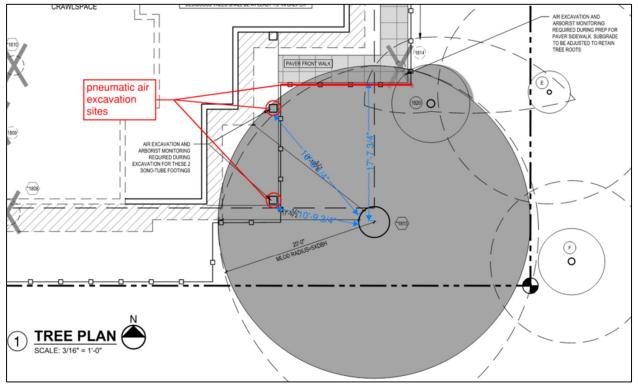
An excerpt from the tree plan showing the areas where air excavation occurred on Nov. 11, 2022. The objective of air excavation was to determine whether structural roots from tree 1813 were present at the deck footings and edge of the proposed front walkway.
